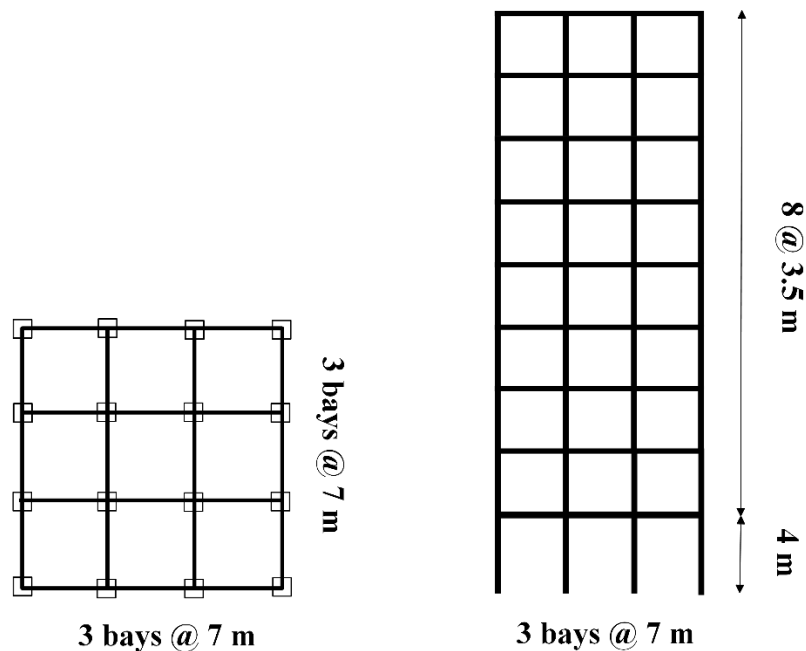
Plan and elevation of the 9-story reinforced concrete building.
